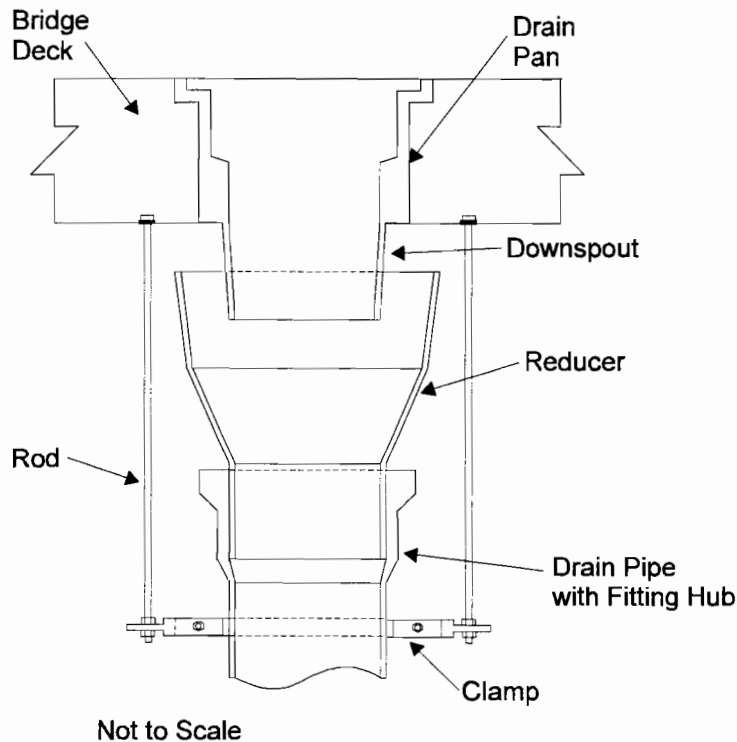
Connection of Deck Drain Downspout to Piping System
